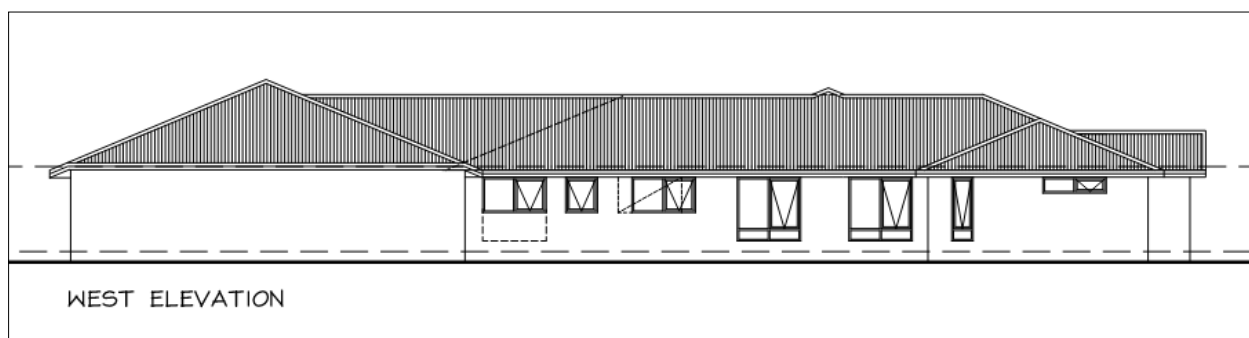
West elevation (Steven Penton Building Design, 2022)
